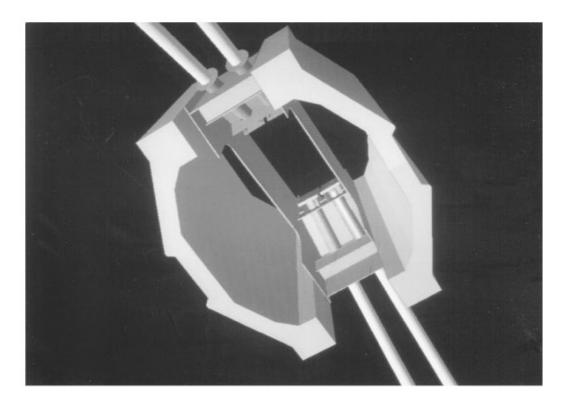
Normandie Bridge — cable stay anchorages. (Courtesy of Campenon BErnard.)
